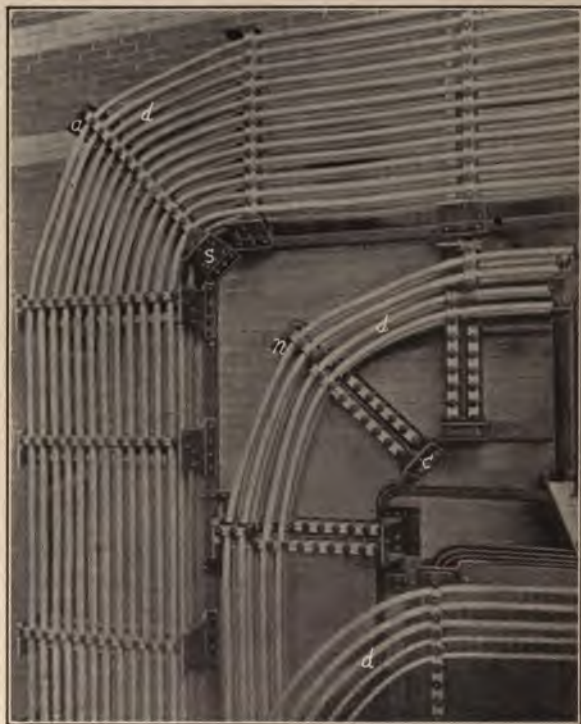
Method of supporting Lead-Covered Cables to Wall of Station by means of Cable Racks.
